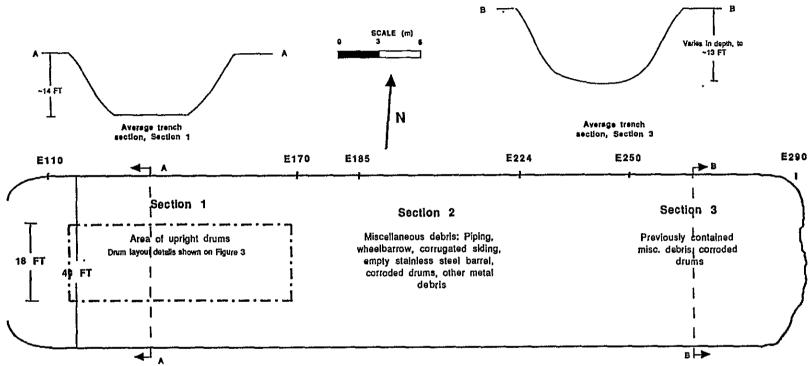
PLANS/SECTIONS OF THE 618-9 TRENCH
